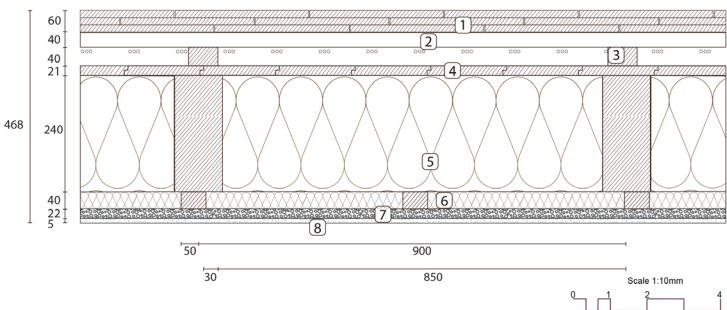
Warm roof callout - Scale 1:100 (Author's drawing)
